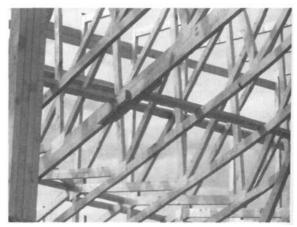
Roof trusses are commonly used to speed construction and conserve natural resources. Similar truss systems are used for floors.
